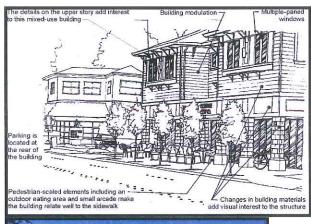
The use of different building materials, window treatments, and roofline brackets add to the visual interest of this building.
